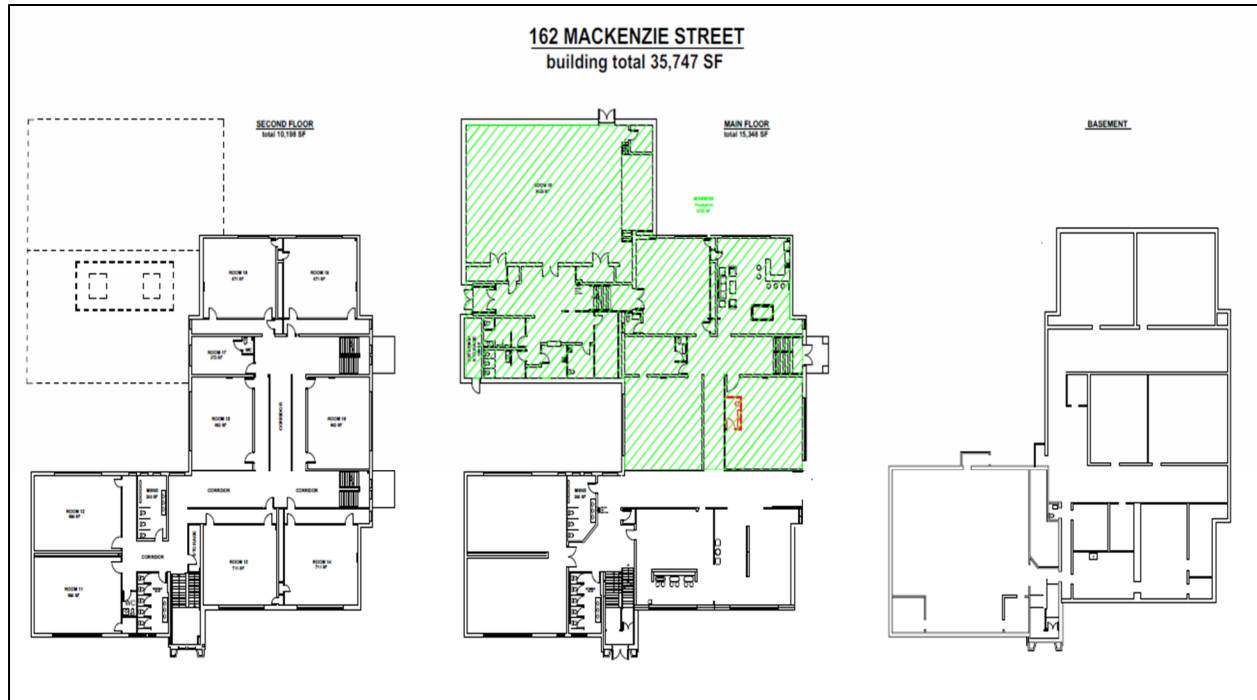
Proposed Site Plan (internal renovations – applicant supplied)
